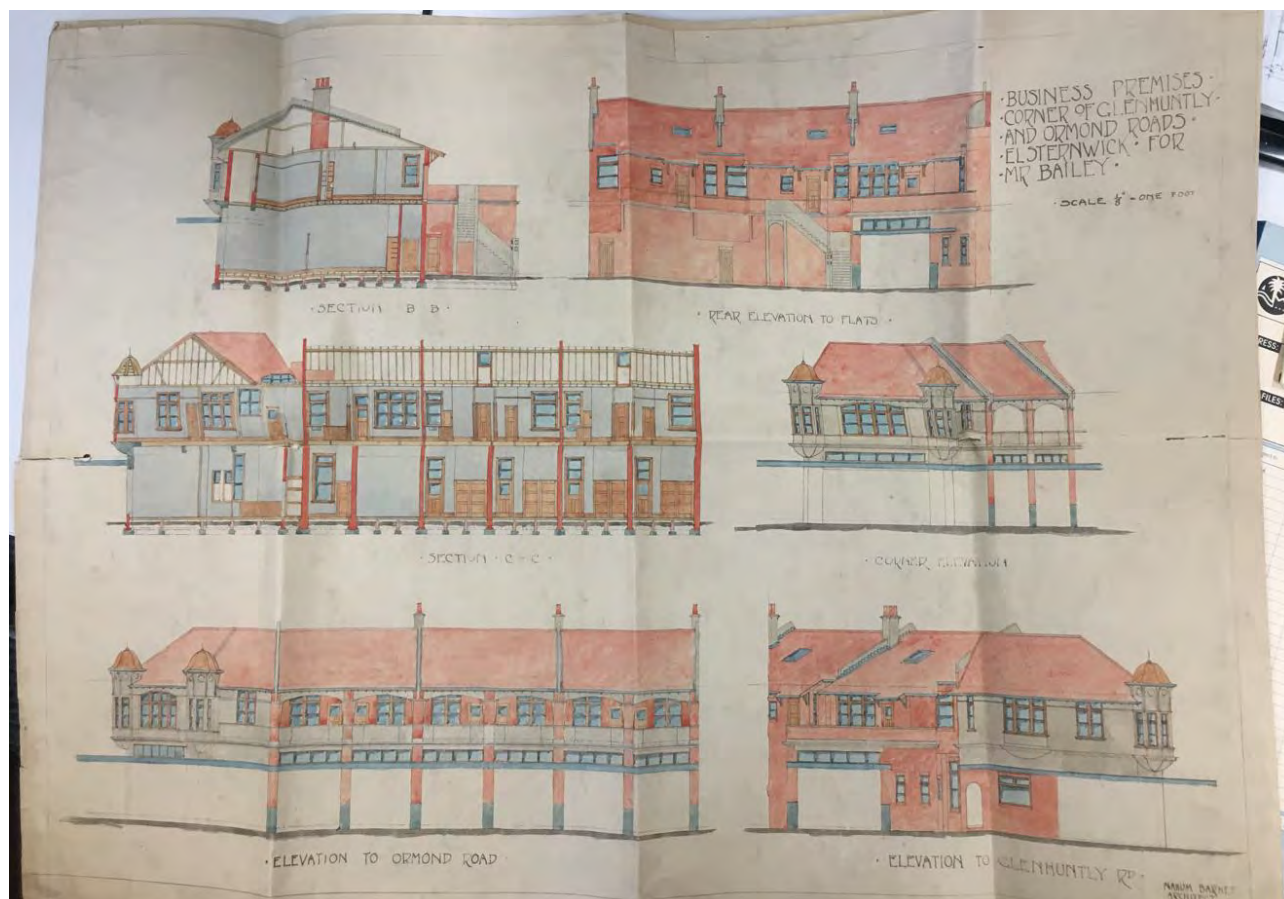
Business premises, corner of Glen Huntly and Ormond Roads, Elsternwick for Mr Bailey (sections and elevations). Source: Nahum Barnet Architect. n.d. Drawings of 1-13 Ormond Road, Elwood. Council records. City of Port Phillip.
